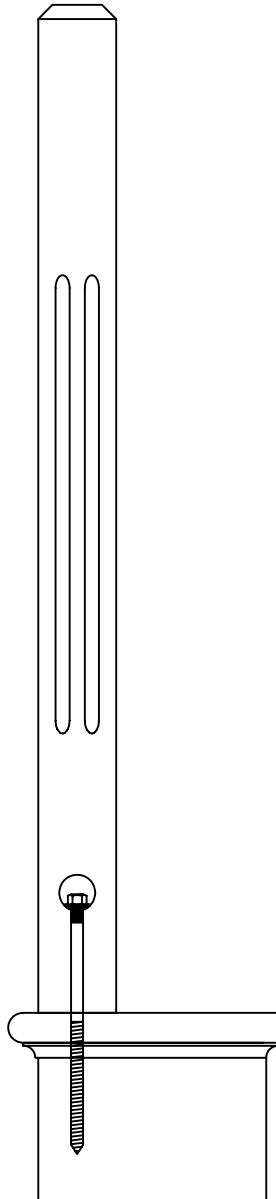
B Interior Connection: Adjustable Baluster Bracket
